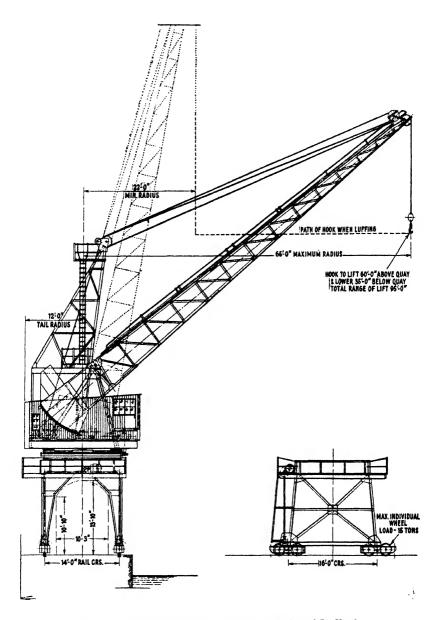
Three Ton Electric Quay Crane (Level Luffing).
